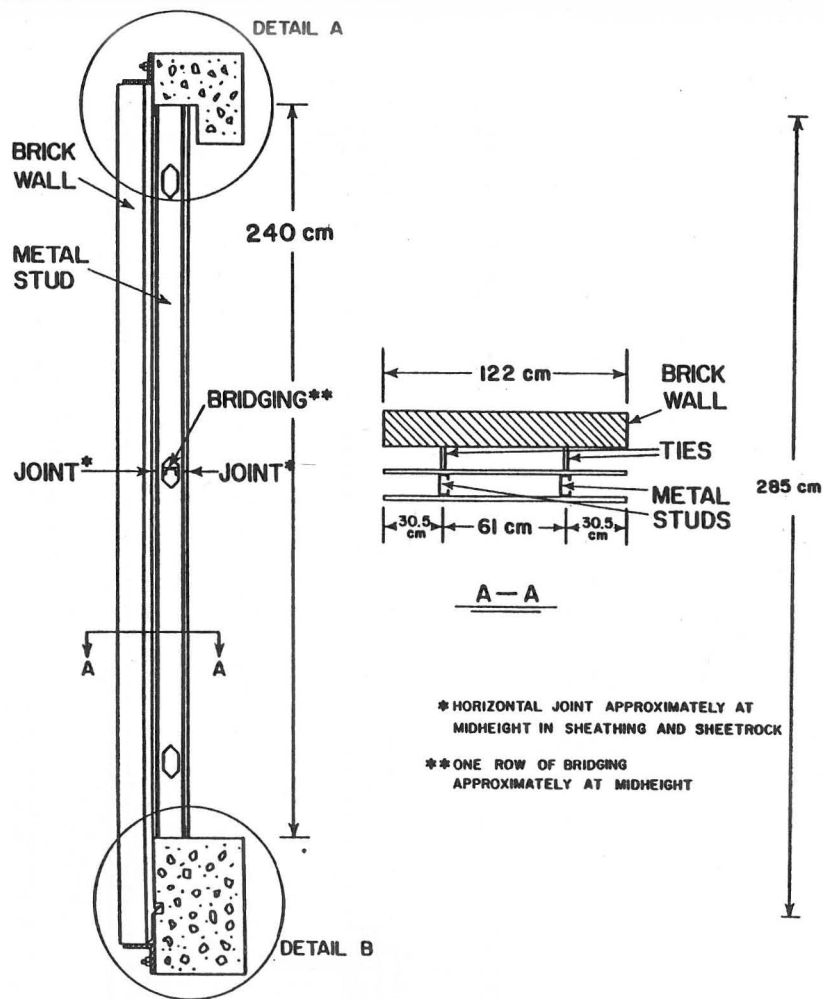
Typical Brick Veneer/Steel Stud Wall
